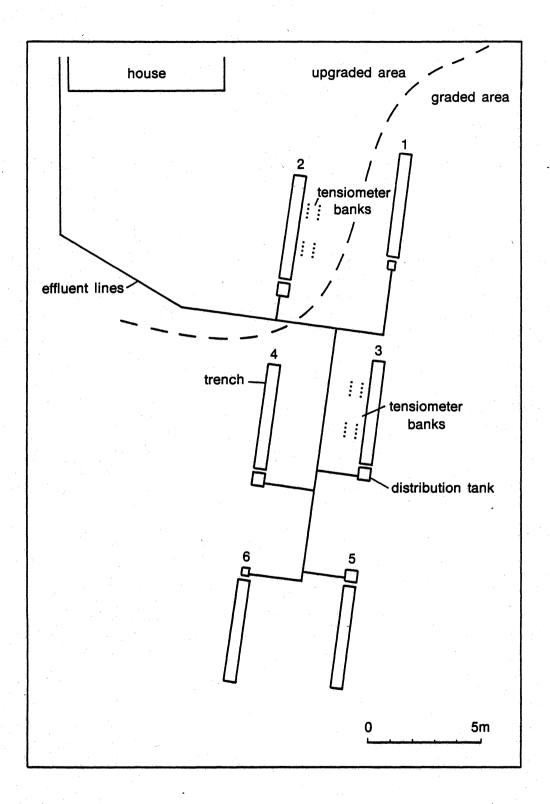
Layout of Site 1: The dots represent tensiometers placed outside of the trench.
